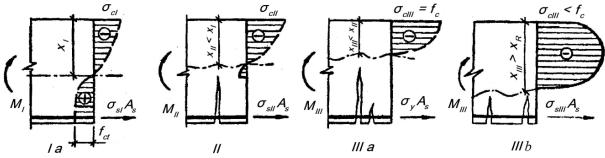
SSS stages of flexural reinforced concrete members without prestressing
